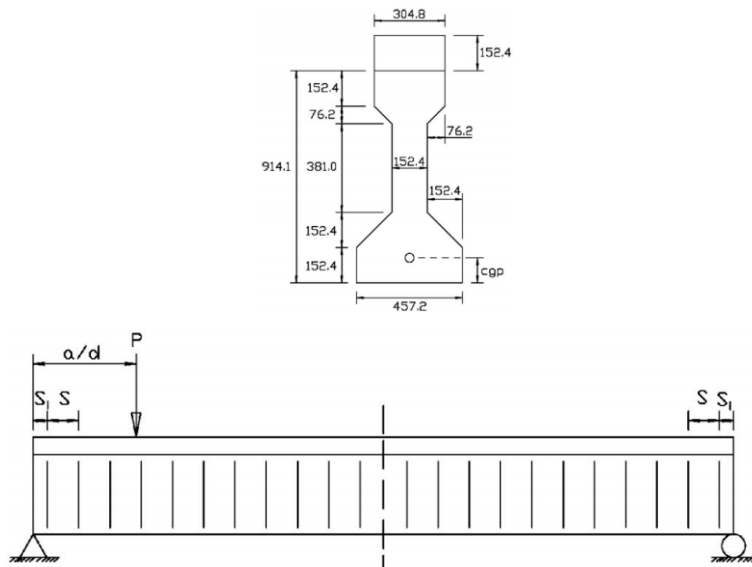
Test setup and stirrups arrangement (dimensions in mm) [Osborn et al., 2012].
